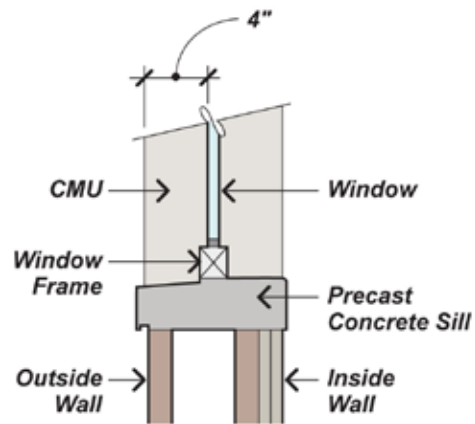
Section of precast concrete sill detail for window detail.
